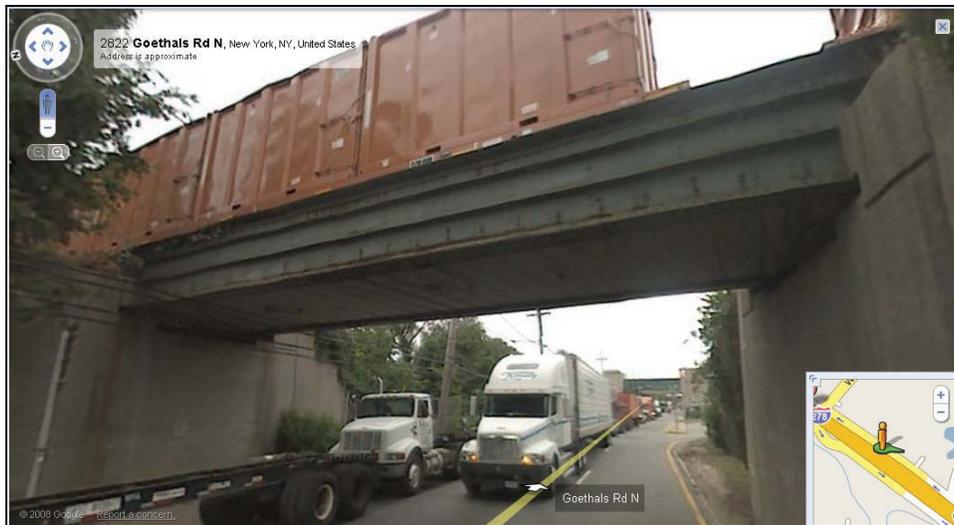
Travis Branch over Goethals Road North. Google Street View.
